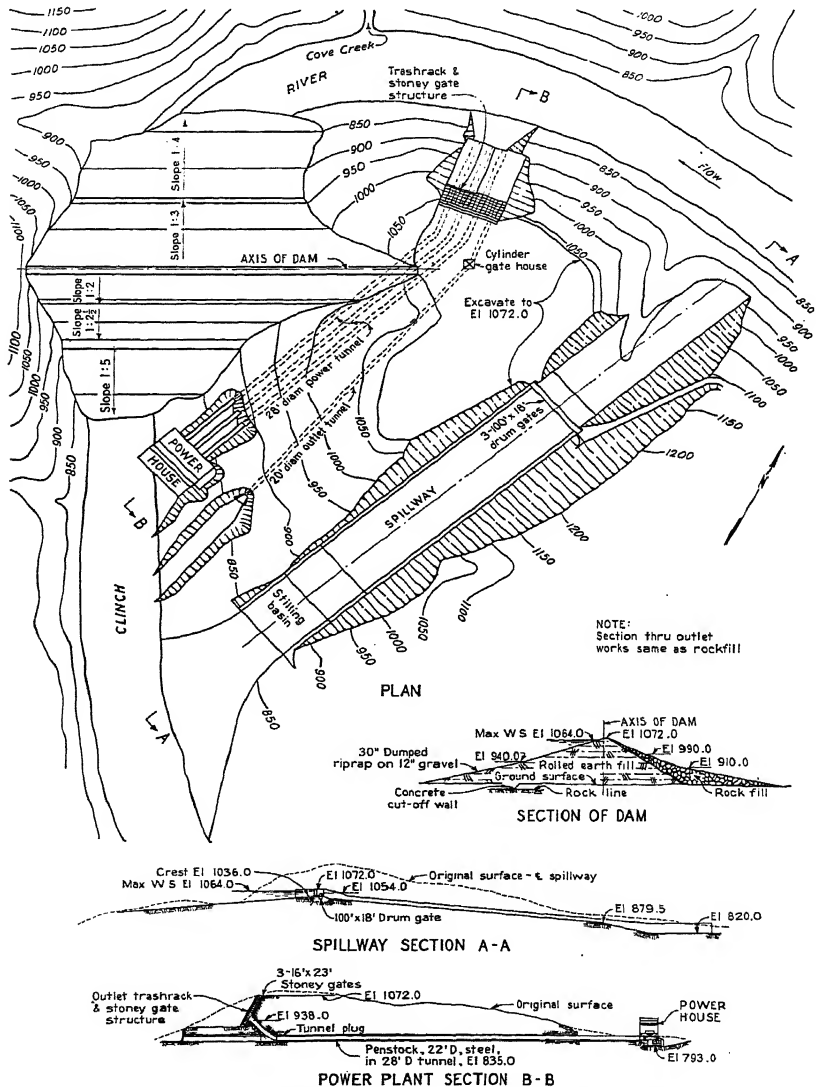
Preliminary design—Rolled earth fill type dam.
